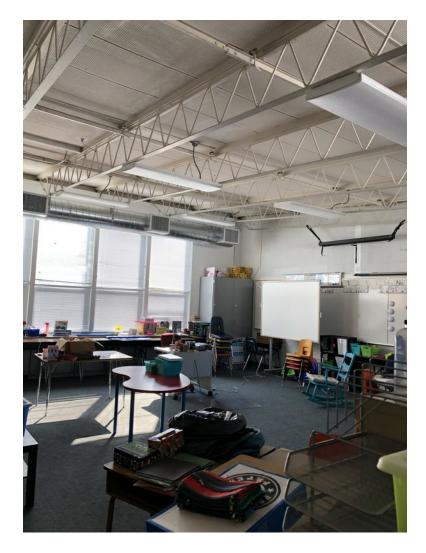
Steel Roof Joists and Gypsum Roof Panels over Classroom (Looking East)
